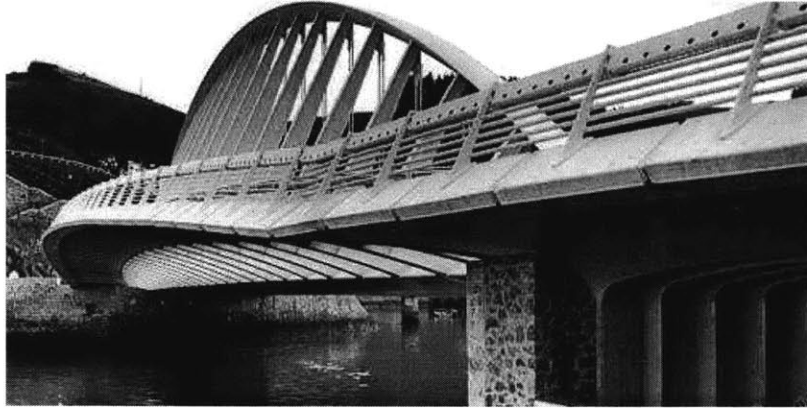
Curved cantilevered pedestrian deck of the Puerto Bridge
